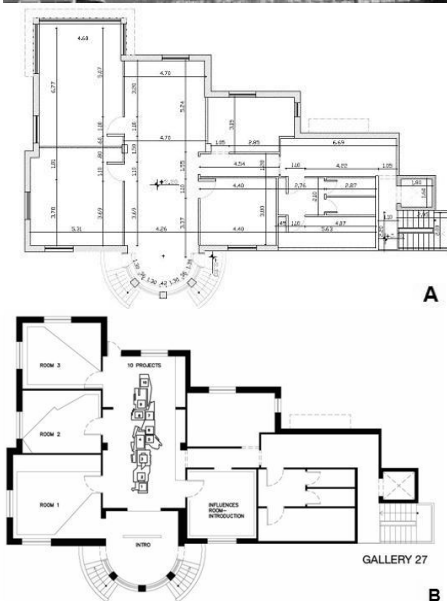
(a,b): before and after of ground floor plan, currently is a galley for the exhibition of arch. Yagmour's projects
